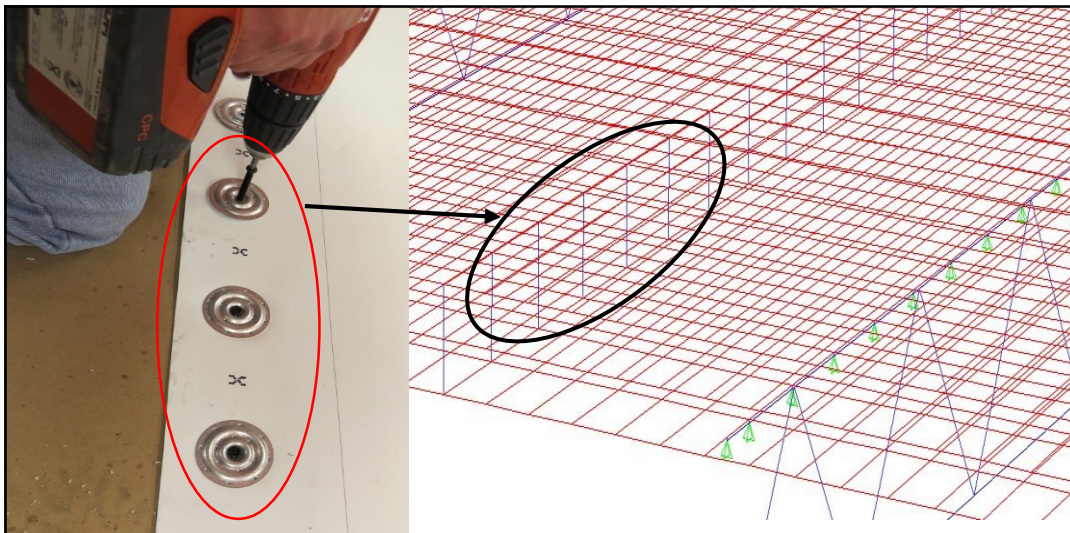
Membrane-deck fastener modelling in SAP2000
